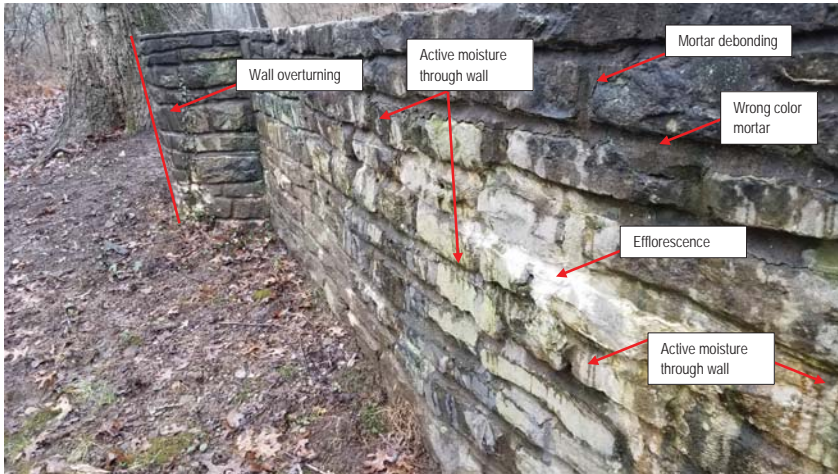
Retaining wall at north side of roadway at top of stairs exhibiting efflorescence due to moisture passing straight through wall. Civil water mitigation may reduce effect in future.
